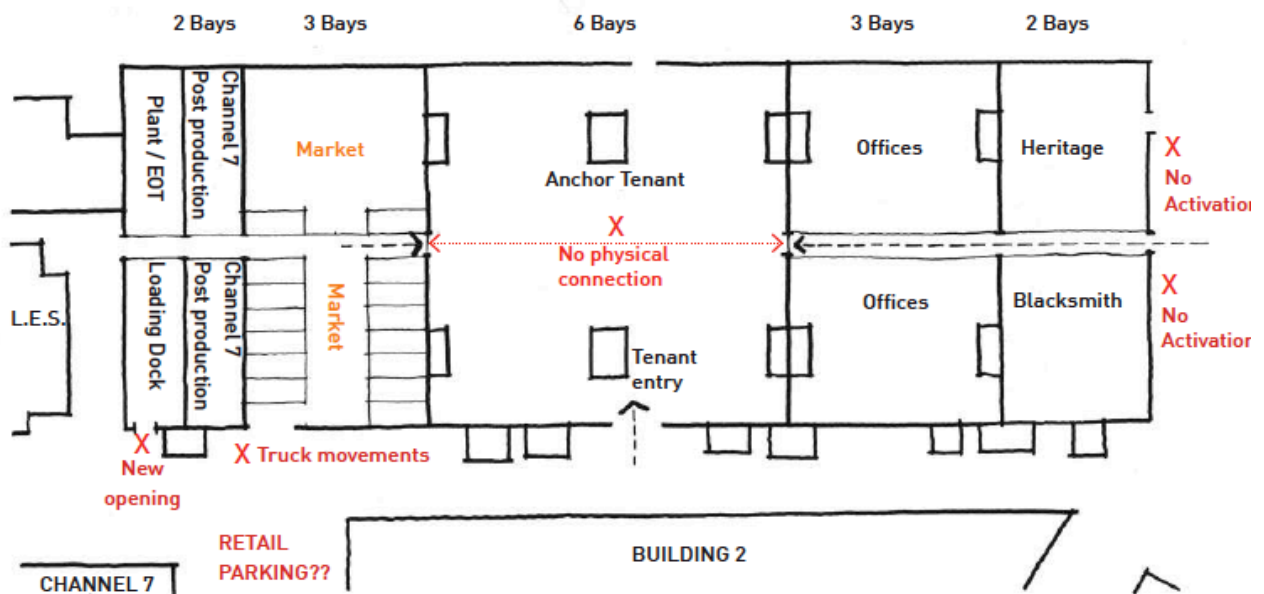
Purported Existing and Proposed Uses - extract p.23 Appendix C Architectural Design Report - Part 1
